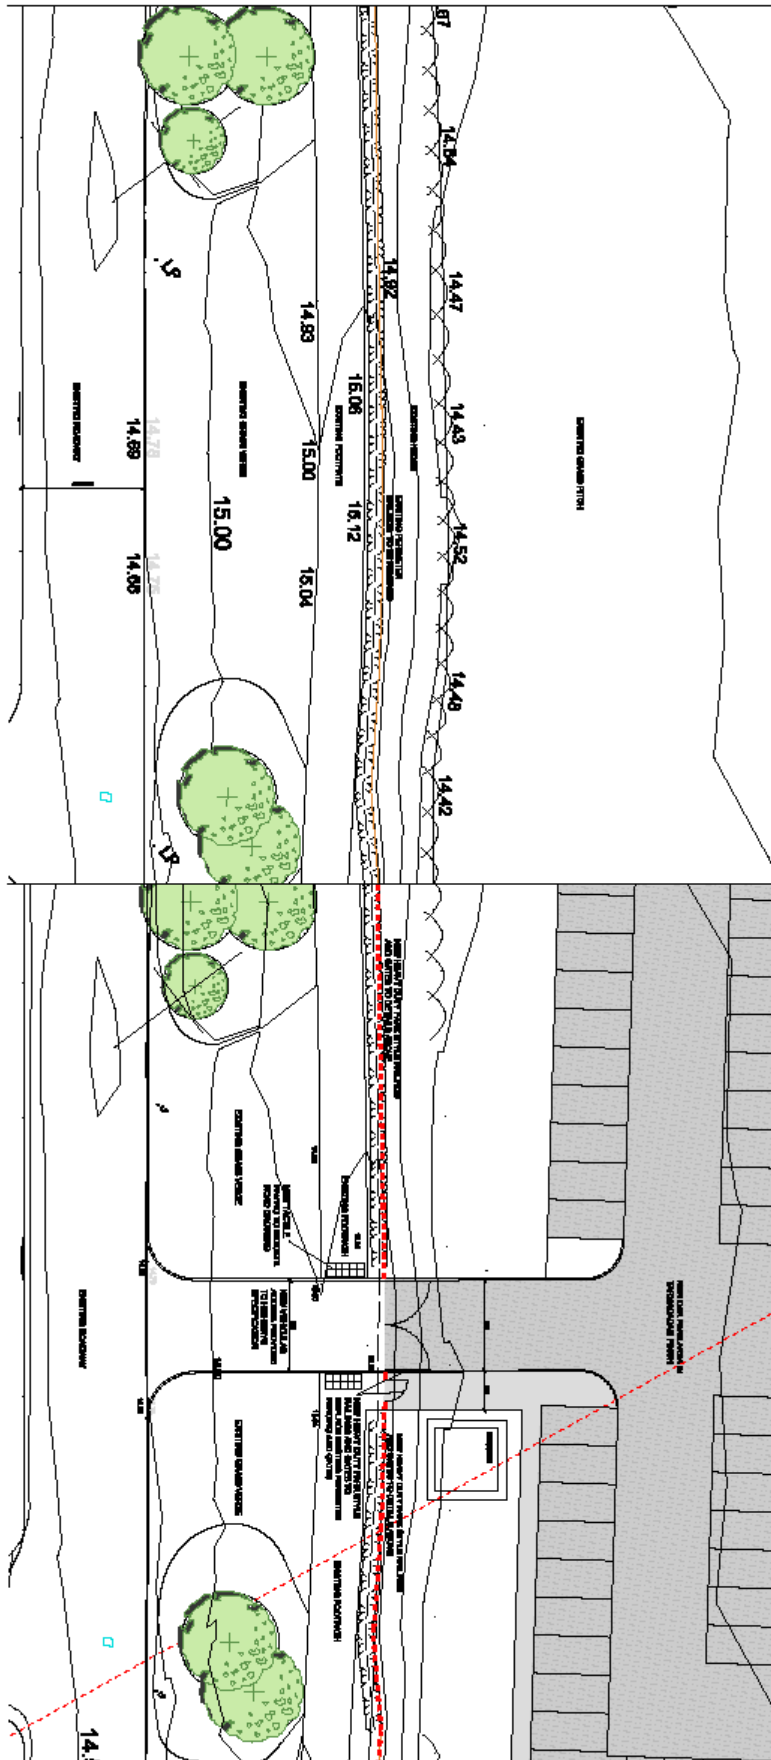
Proposed Upgrading of Access to Site (Existing and Proposed Layouts)
